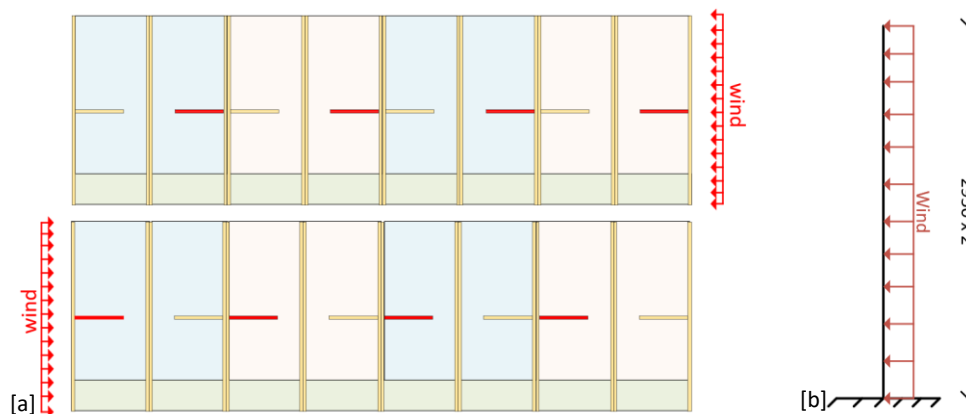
[a] Principle of active and passive walls; [b] Structural scheme of wall (Self-produced).
